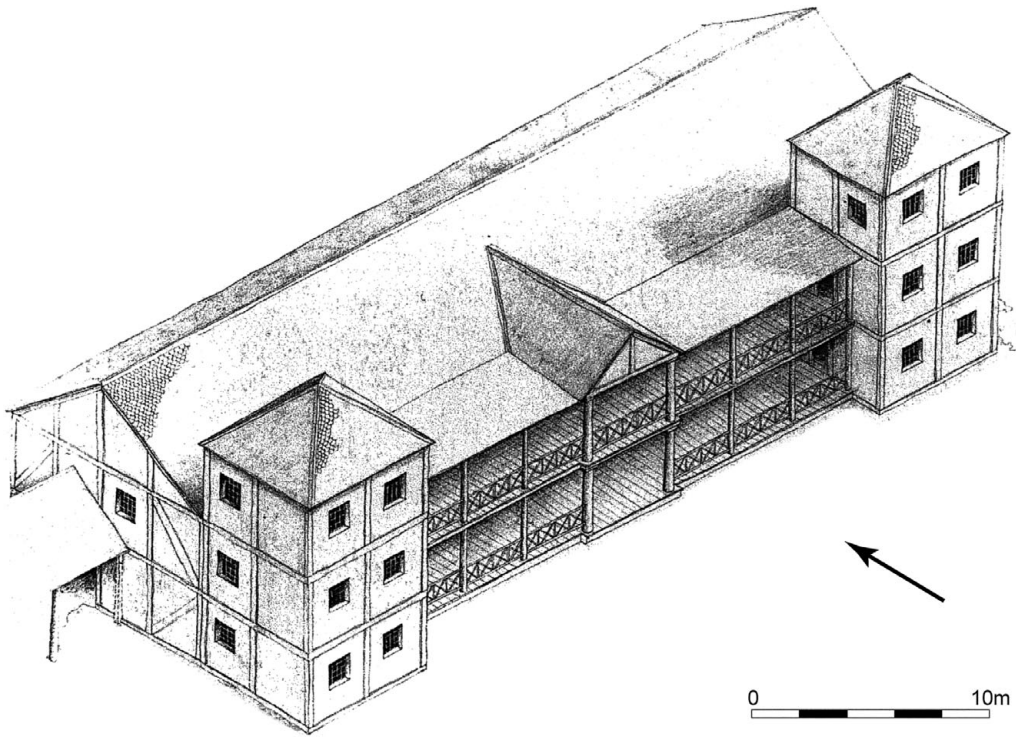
Reconstruction drawing of the key timber-framed Building 10 (Barker *et al.* 1997: fig. 252).
